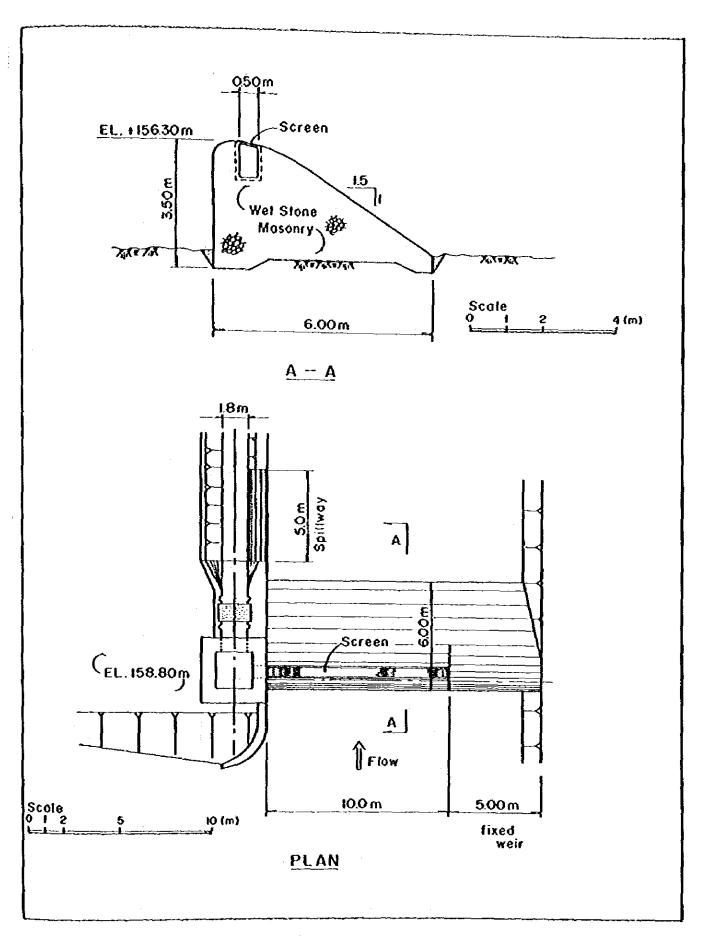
TYPICAL SECTION OF PAROTA INTAKE WEIR
